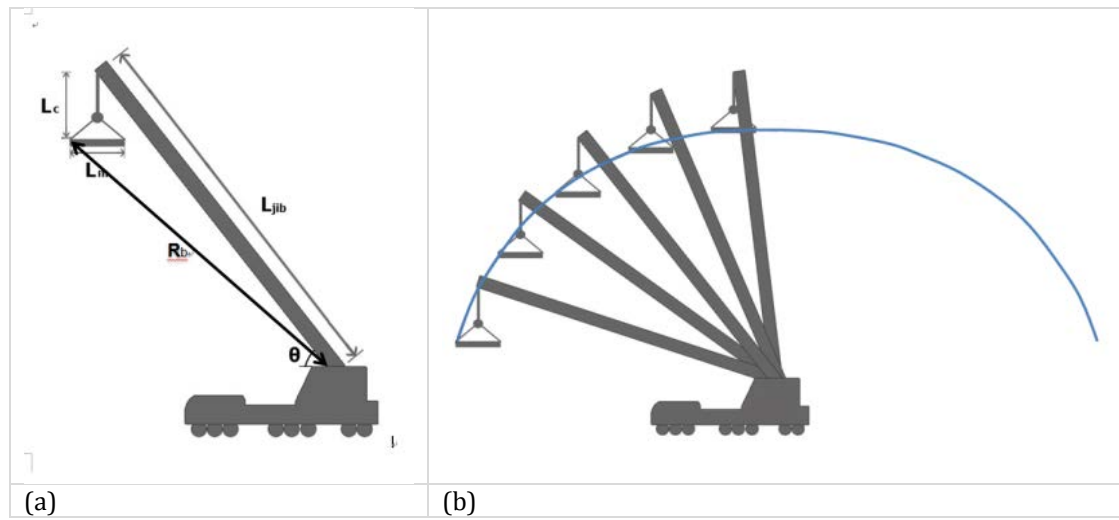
(a) Workable radius and (b) workable semi-sphere when hanging a structural beam
